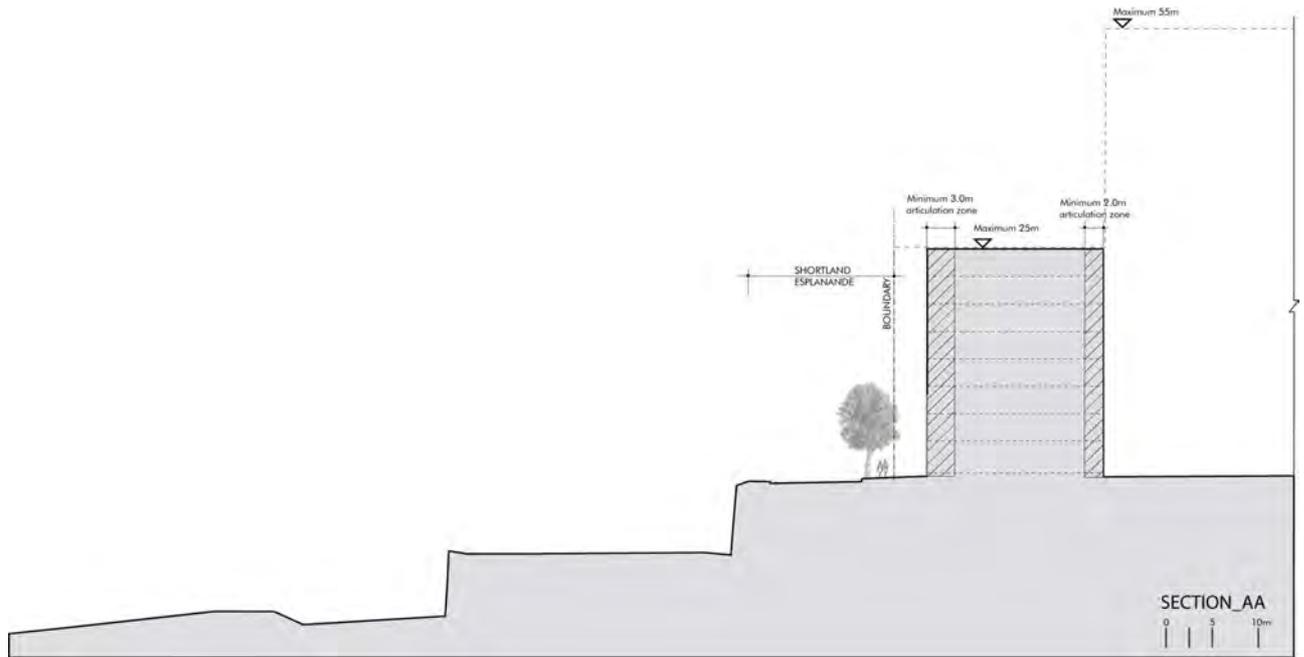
Shortland Esplanade 1 typical street cross-section A-A
